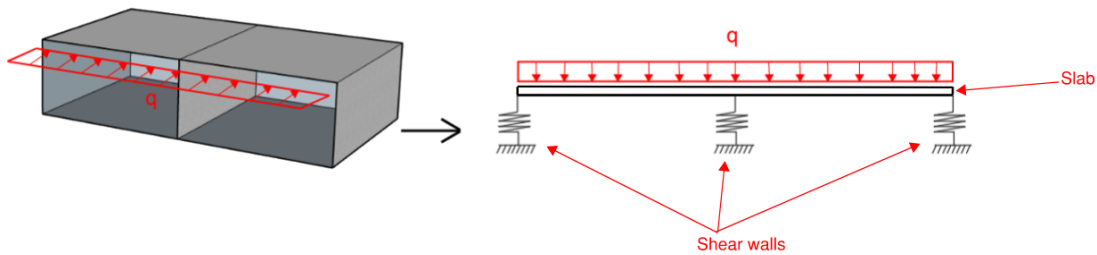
For $C > 10$ the load is distributed depending on the stiffness of wall. q denotes a uniformly distributed horizontal load acting on slab.
